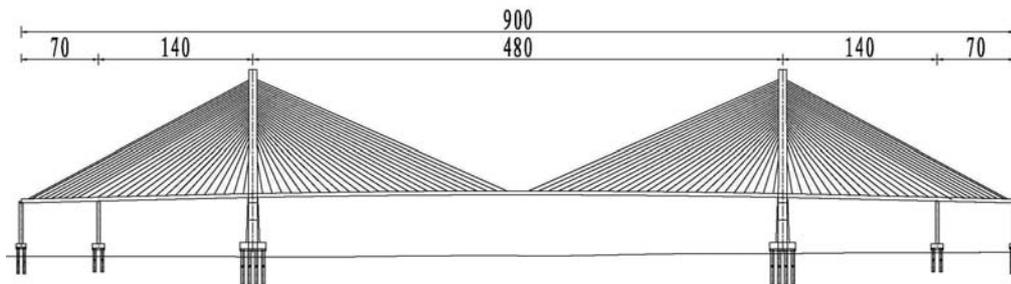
Span arrangement of the second Jiaojiang Bridge
